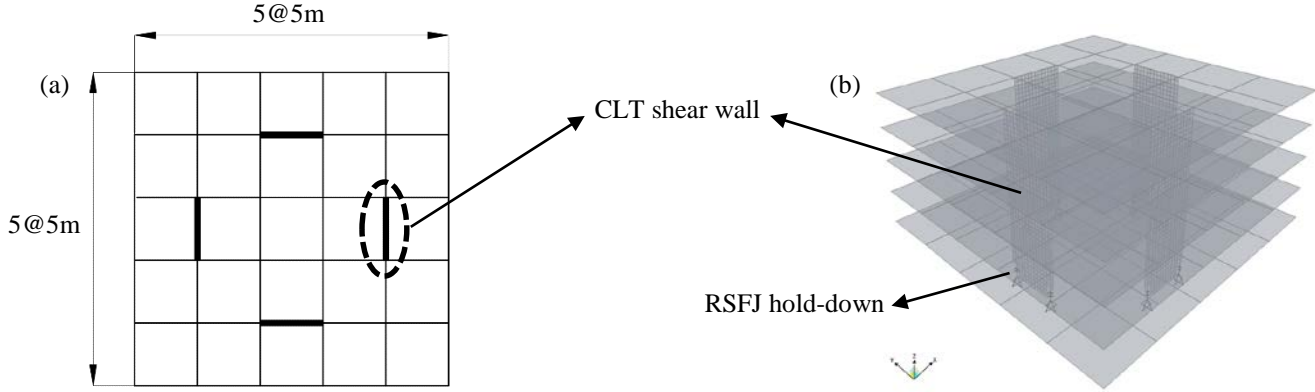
Numerical model: (a) plan view of the structure, (b) general arrangement
